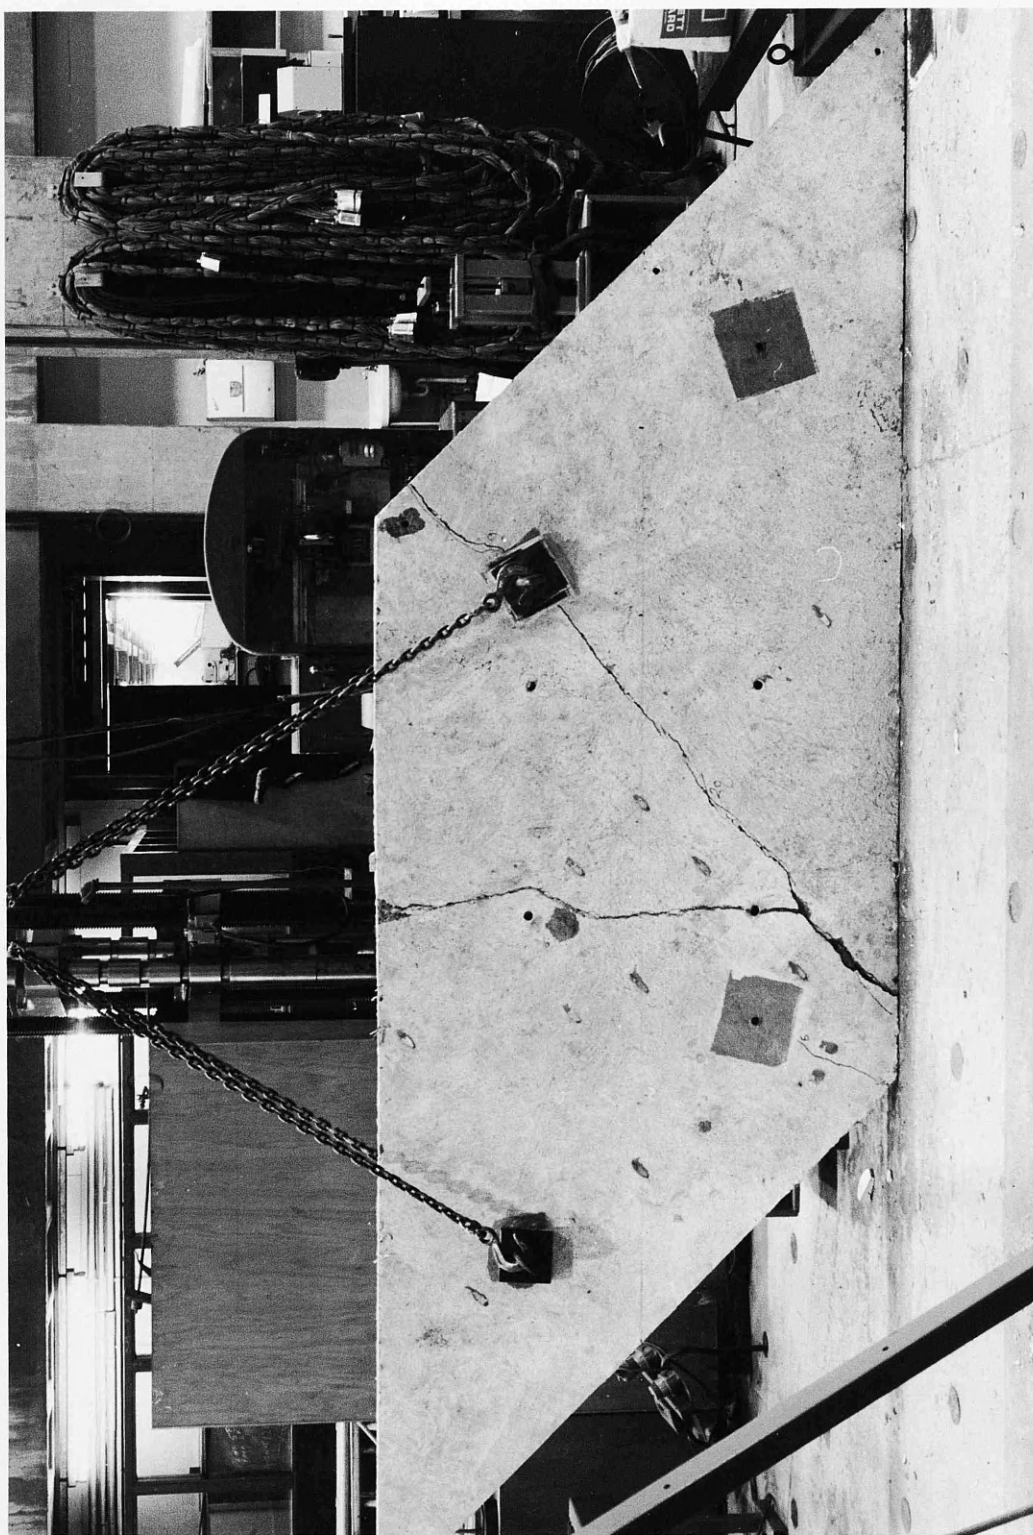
MODEL SKEW SLAB NO. (4) Top surface after failure
